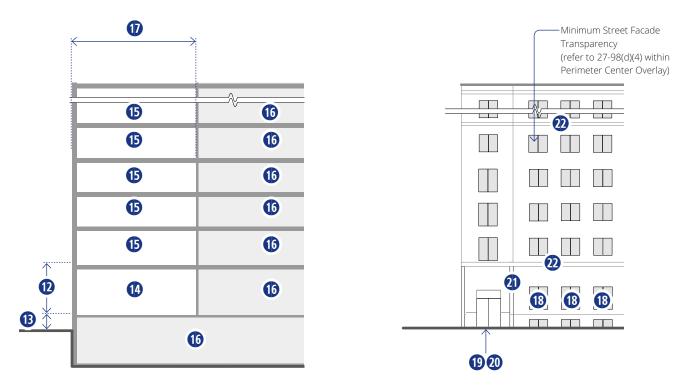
General Building: Floor-to-Floor Height & Use Requirements
